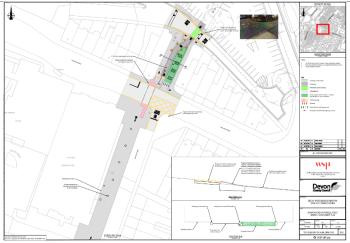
SCHEME IMAGE OF DENMARK ROAD / RUSSELL STREET ELEMENT
